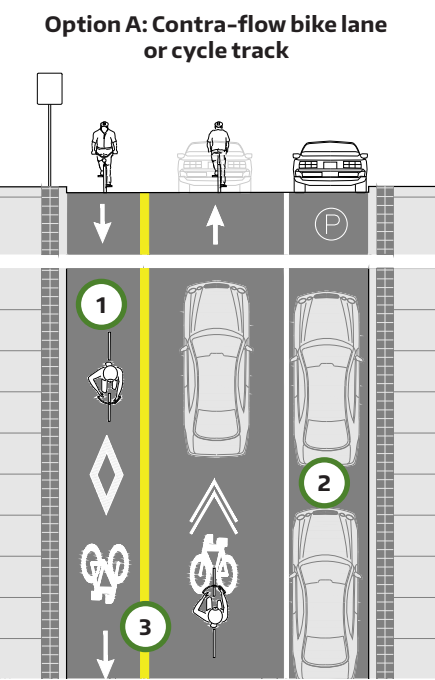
Plan view and street section of conventional contra-flow bicycle lanes.
